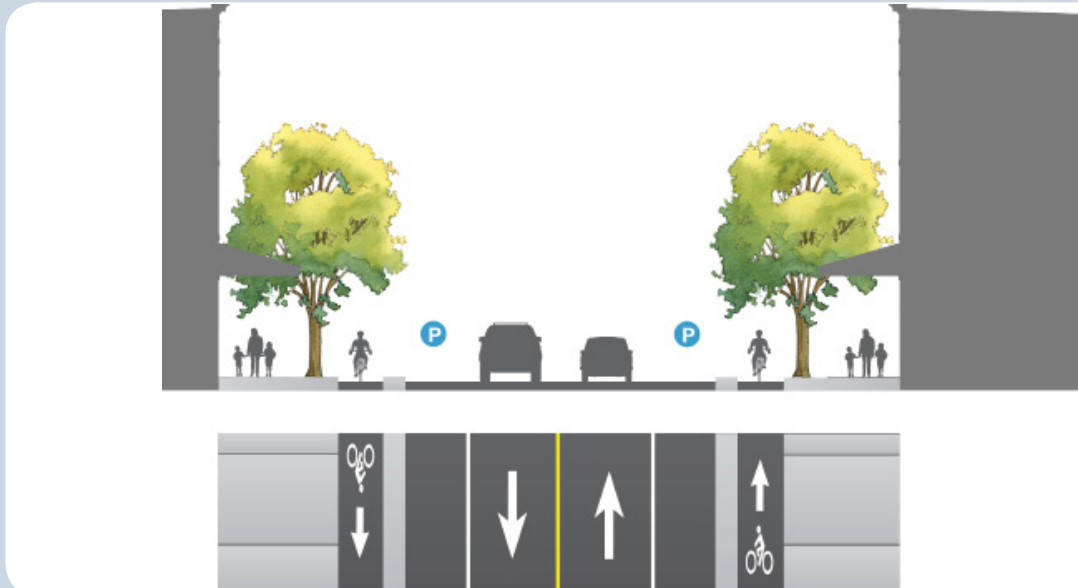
Main Street (Between A Street and B Street) Proposed Improvements - Option 1
